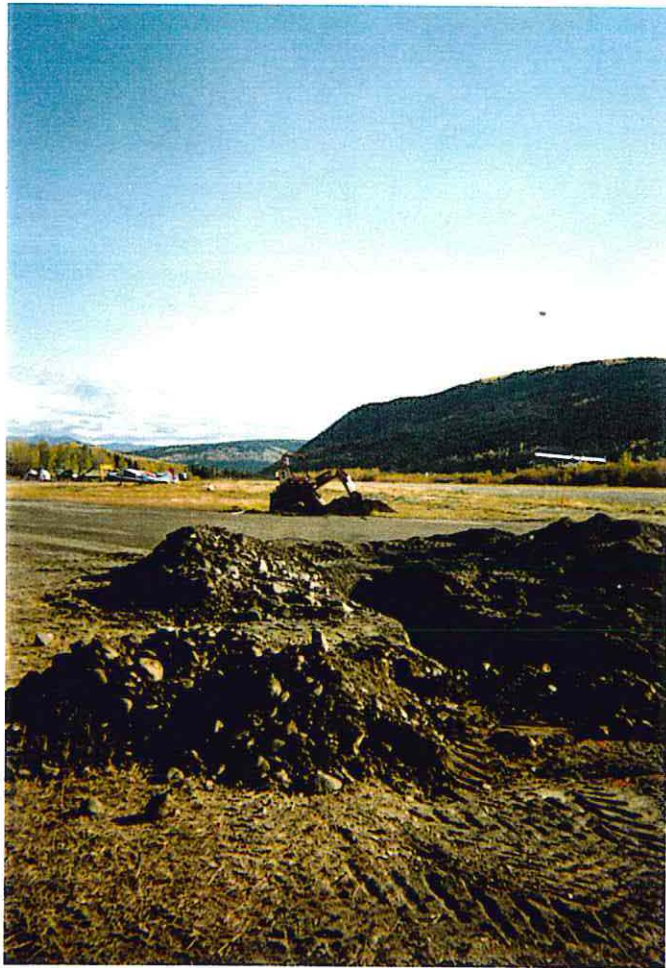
Repair Area 1 – Additional Repairs to VASES Cable
